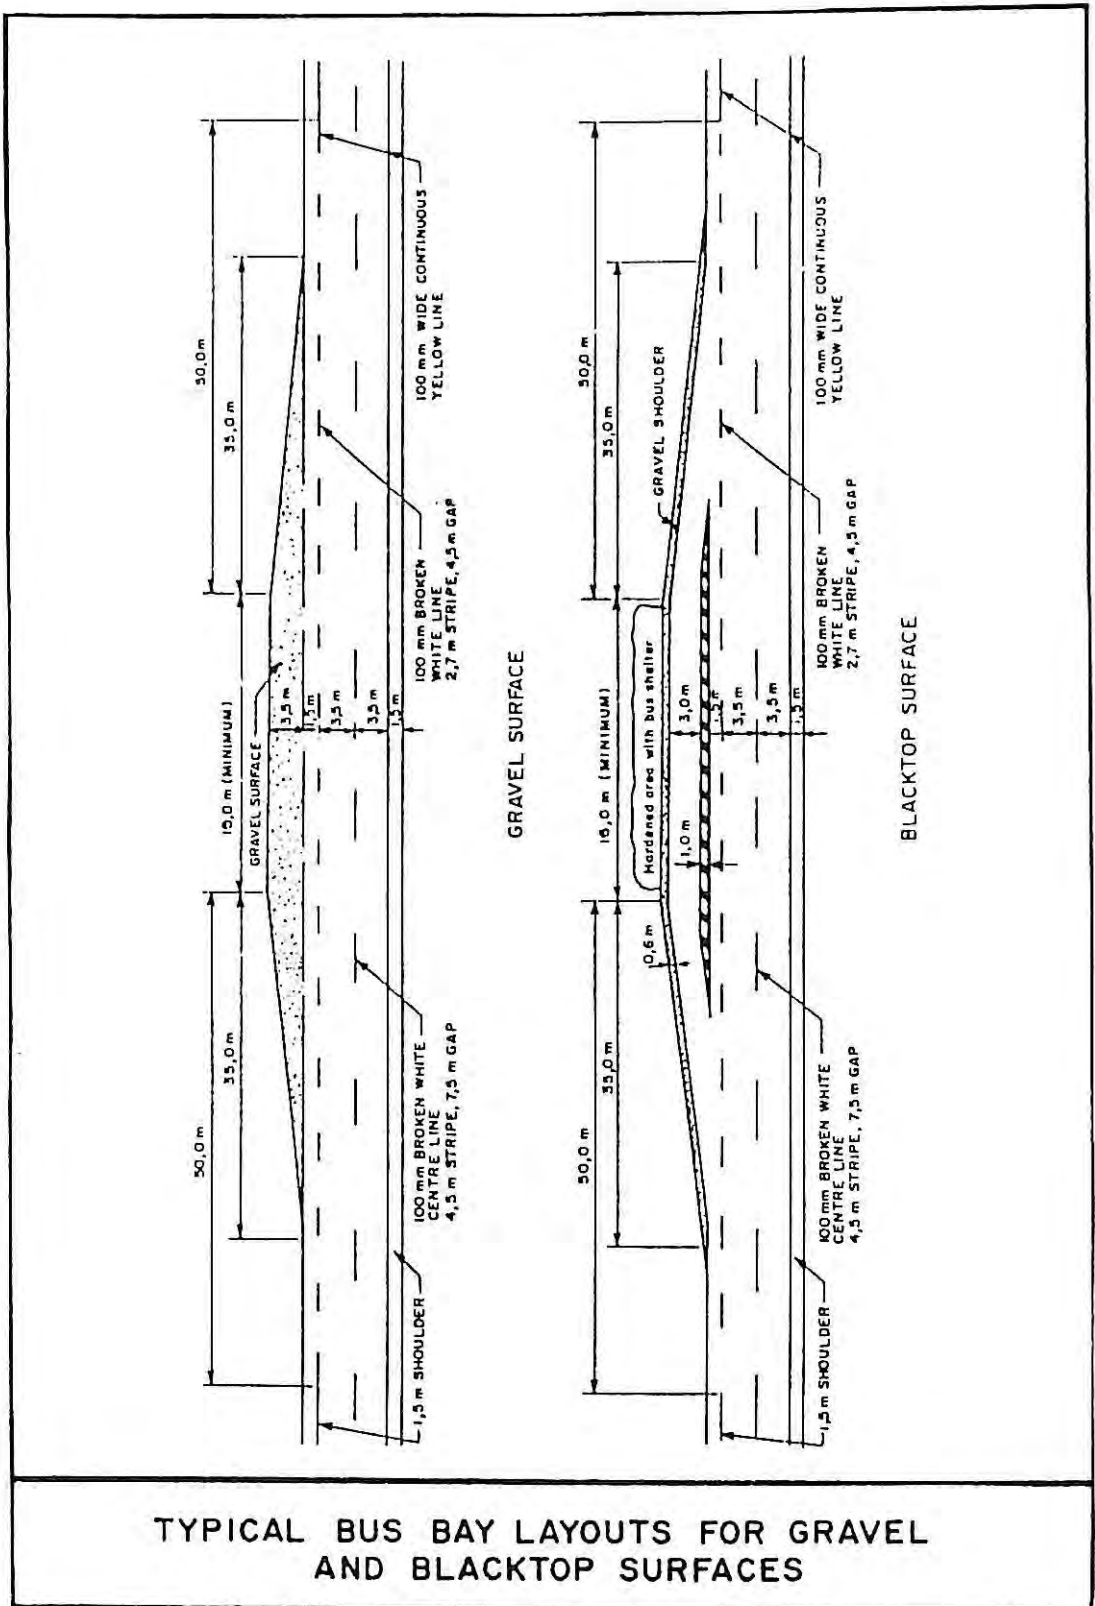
TYPICAL LAYOUT OF BUS BAYS
